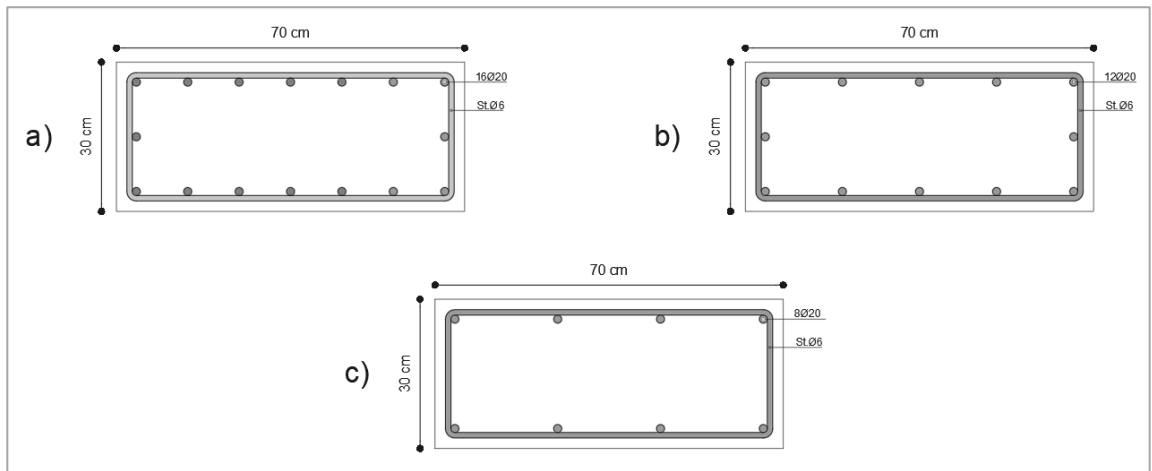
Column type “C – 1c” reinforcement details, a) used in floor 1-5, b) used in floor 6 and c) used in floor 7 of E Template (Durrës) building
